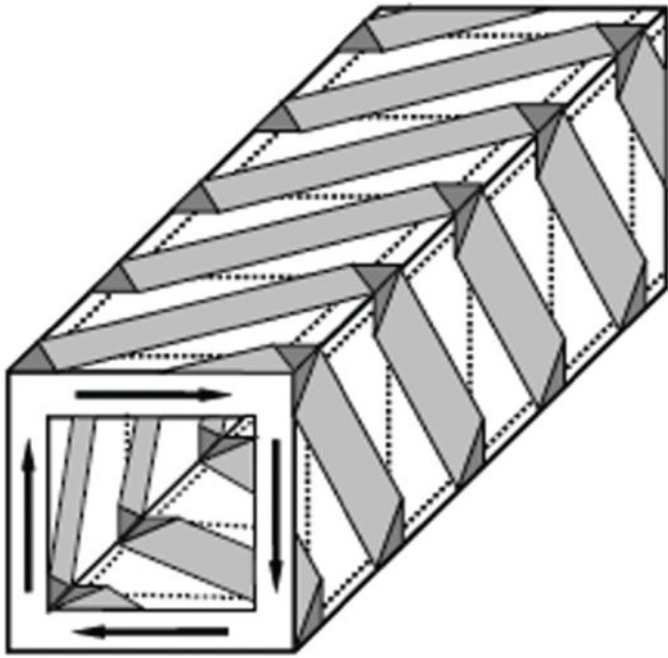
Strut-and-tie model of a space truss subjected to a torsional moment. Source: *Anchorage of Headed Reinforcement in CCT Nodes*.²
